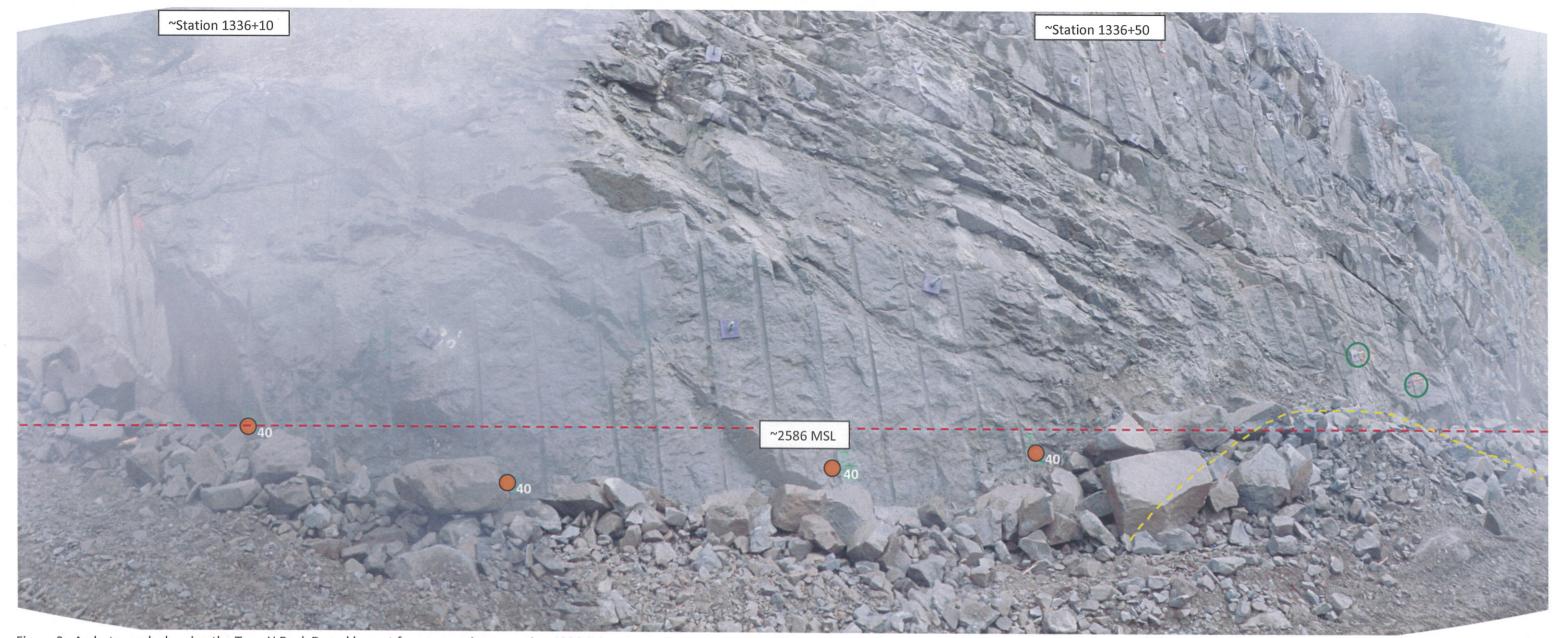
A photograph showing the Type H Rock Dowel lay out from approximate station 1336+10 to 1336+50 at approximate elevation 2586. Note the hard toe located around station 1336+75 from 2010 (Yellow Dashed Line).
